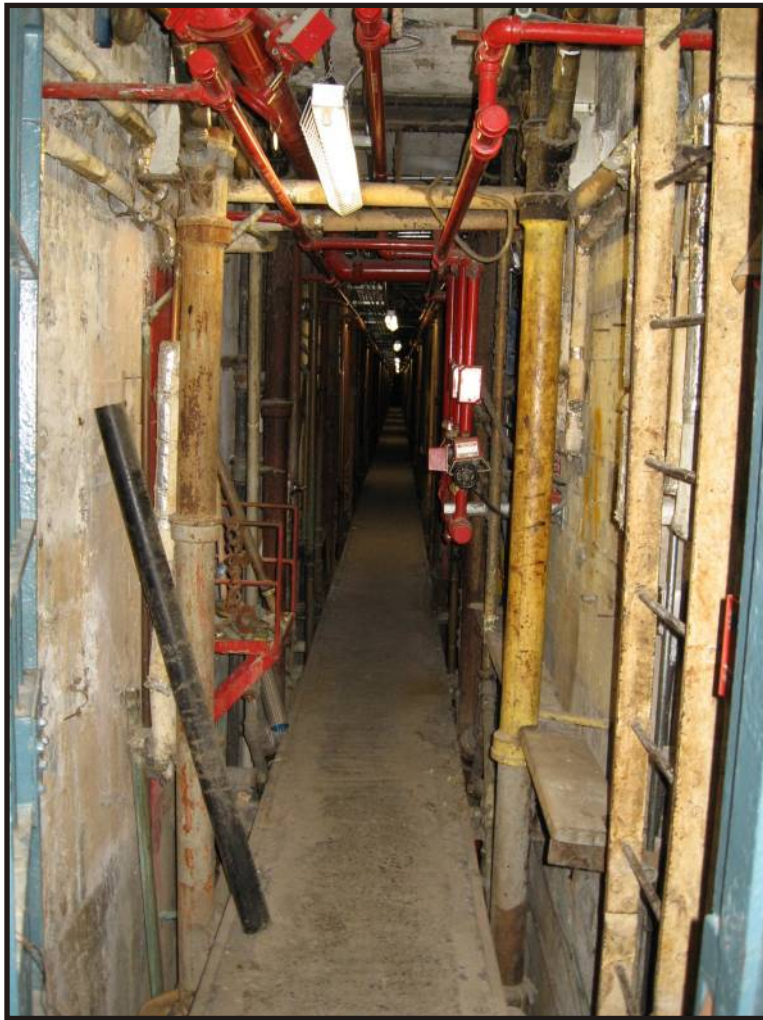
FIRST FLOOR SERVICE CORRIDOR ROOM 108 (img\_2392.jpg)
